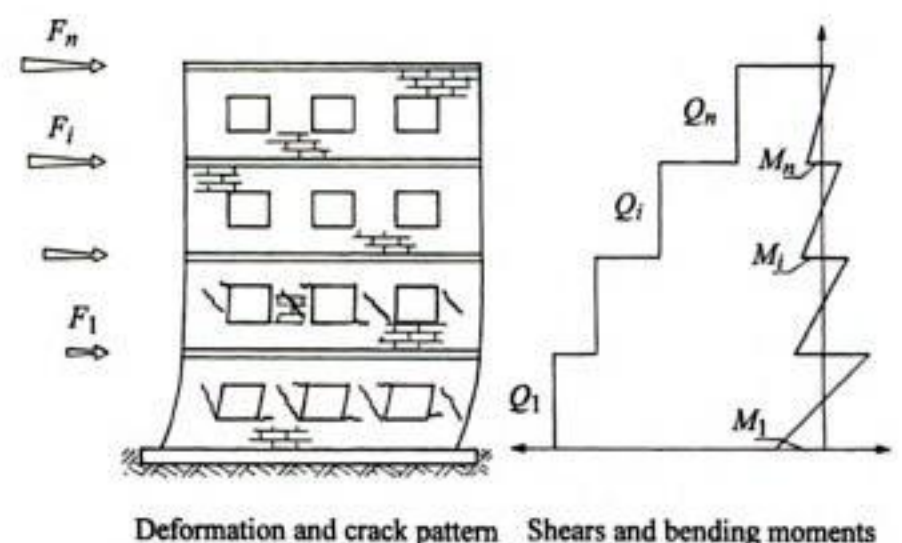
Shear mechanism: coupled shear wall with weak piers.
